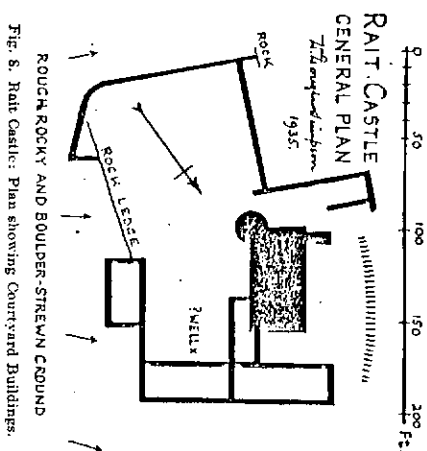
Rait Castle: Plan showing Courtyard Buildings.
